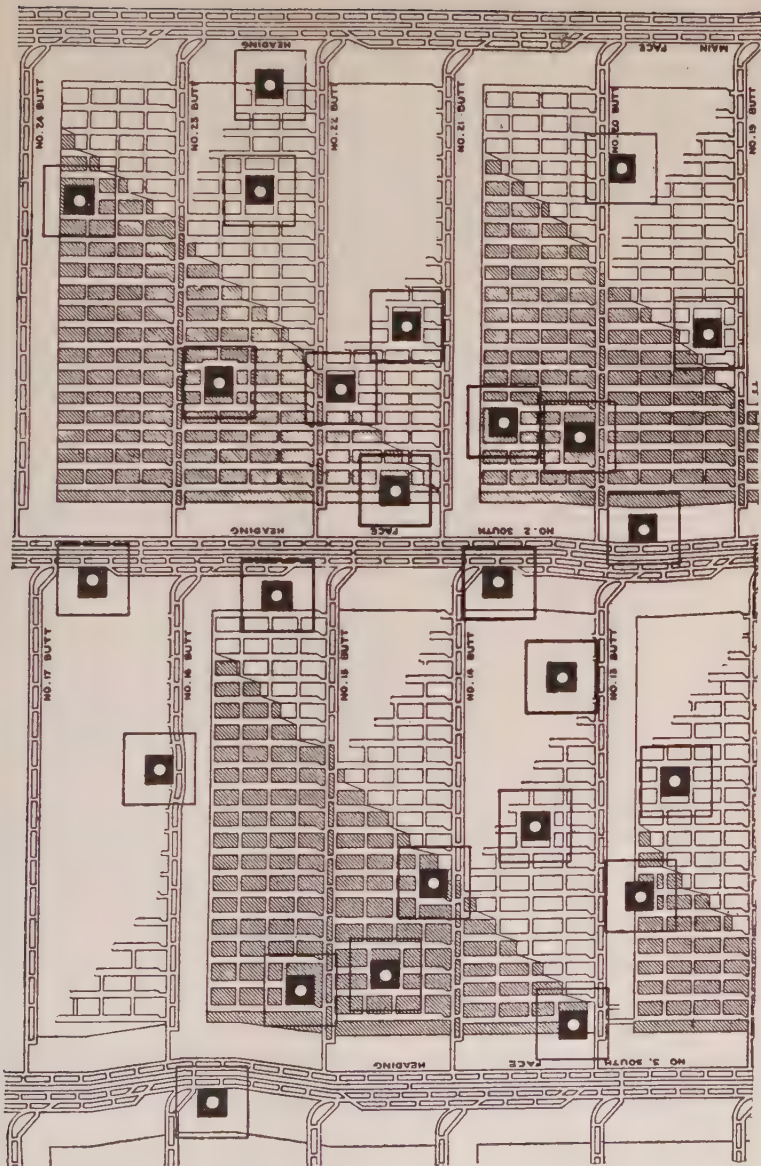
PROJECTED PLAN OF MINE WORKINGS WITH GAS WELLS SURROUNDED BY PILLARS OF COAL.
